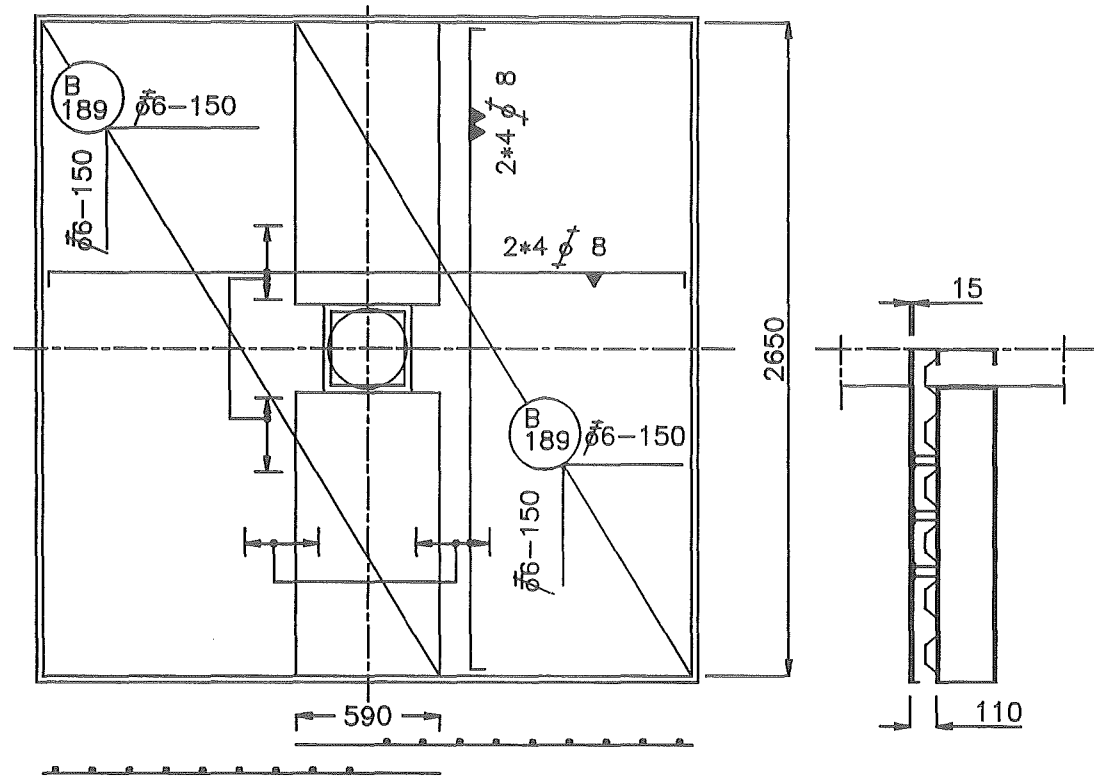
Reinforcement details for series 4 test specimens with CHS/RHS columns
